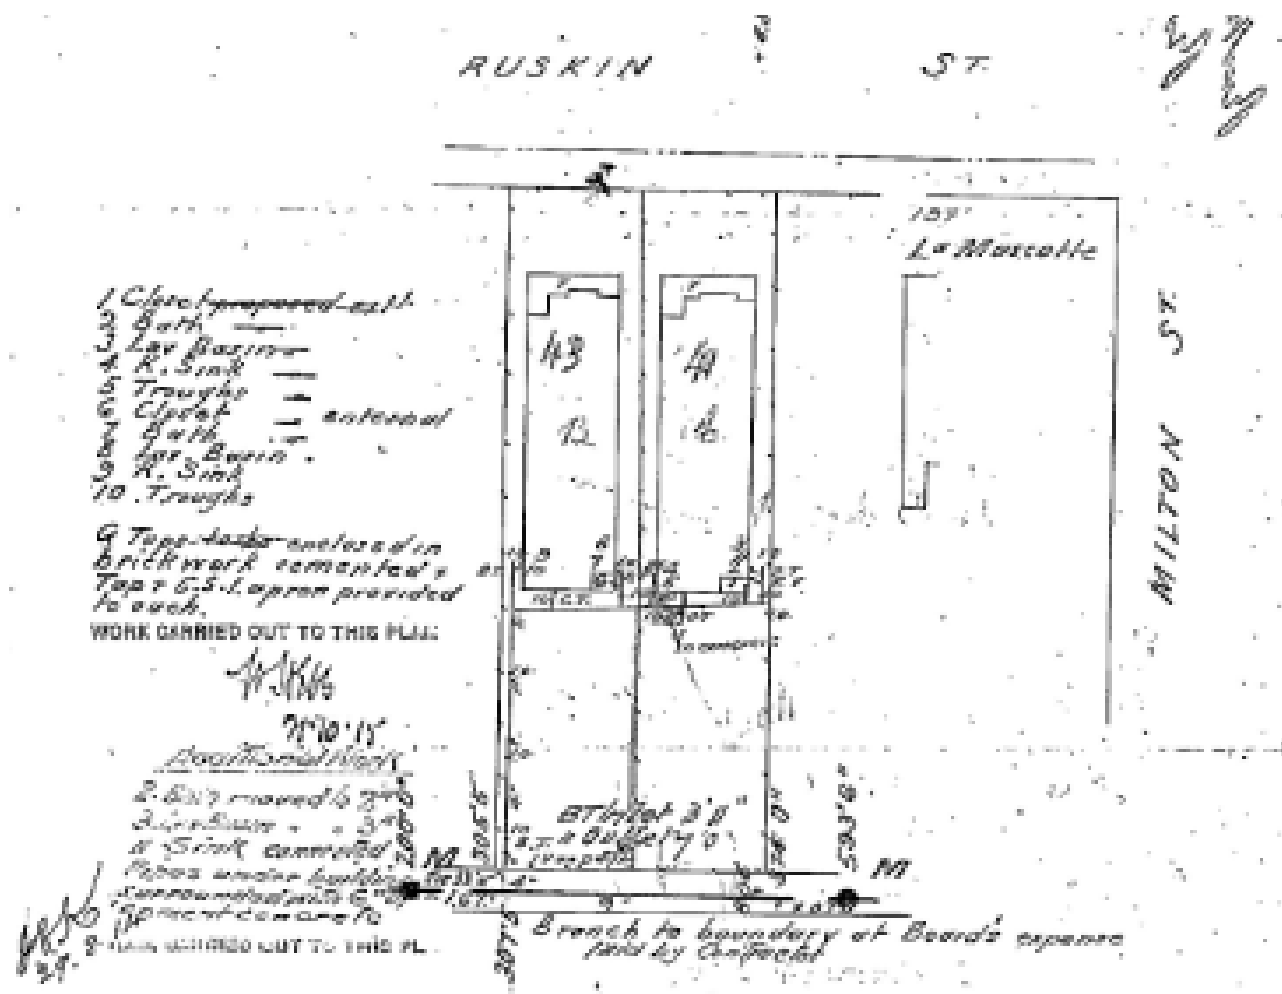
1914 Property Drainage Plan of 41 Ruskin Street, Elwood. Source: The Melbourne and Metropolitan Board of Works. 1914. Property Drainage Plan no. 96049. Textual records. South East Water.
